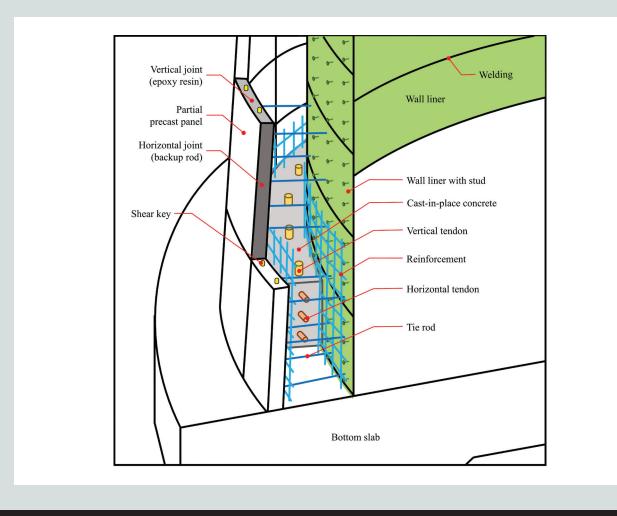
Conceptual drawing of outer tank construction using partial-thickness precast concrete panels.
